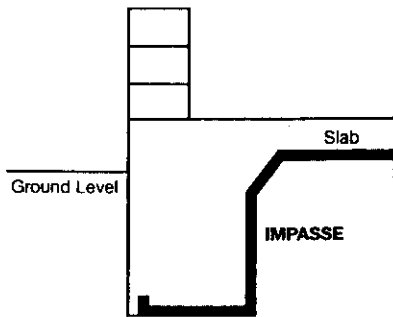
Exposed slab edge from finished ground level to first course of masonry.
